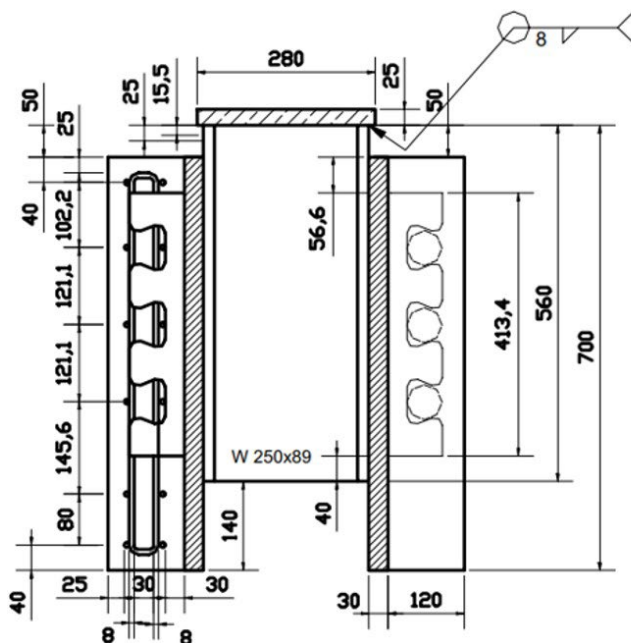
Dimensions of specimens (in mm) and experiment setup (group D2).
